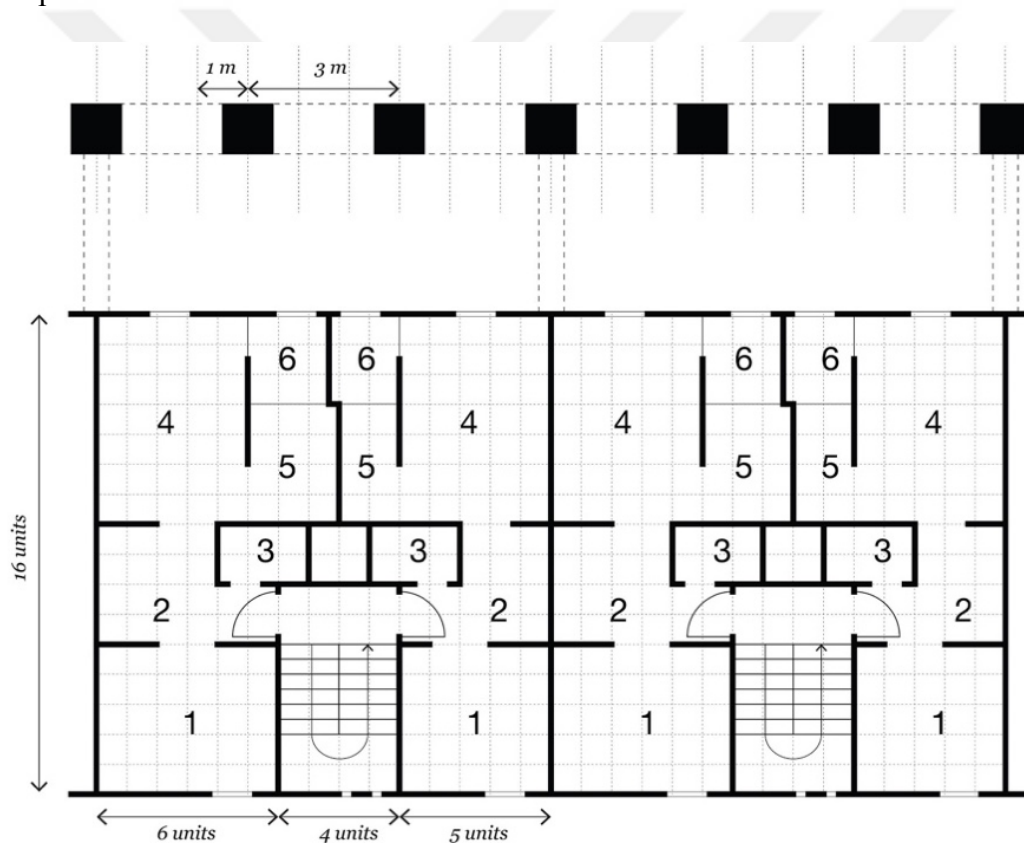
The plan of two adjacent blocks from the 200 Colonnes demonstrating the apartments' layout. (1) bedroom, (2) entrance, (3) toilet, (4) living room, (5) kitchen, (6) patio.
